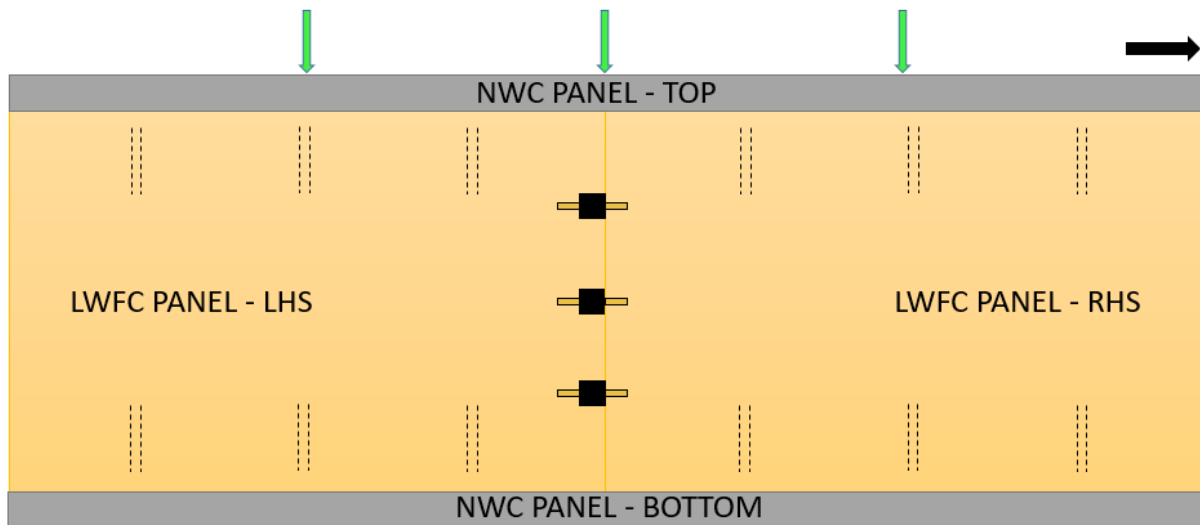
Physical scale test 1 showing pull-over load and connection placement. Three vertical connection boxes and six horizontal grouted rebar per LWFC panel are indicated.
